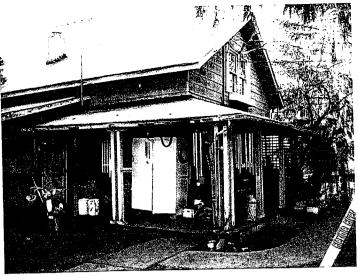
Northern house observed on subject site. Siding is asphaltic shingle material.
